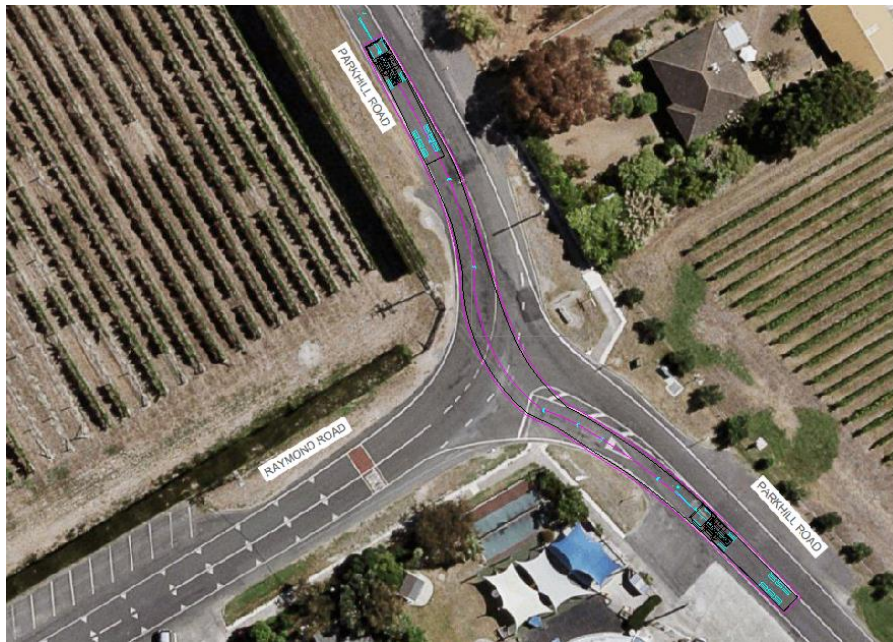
Vehicle tracking – Parkhill/Raymond Road intersection – Right-turn onto Parkhill Road (North)
